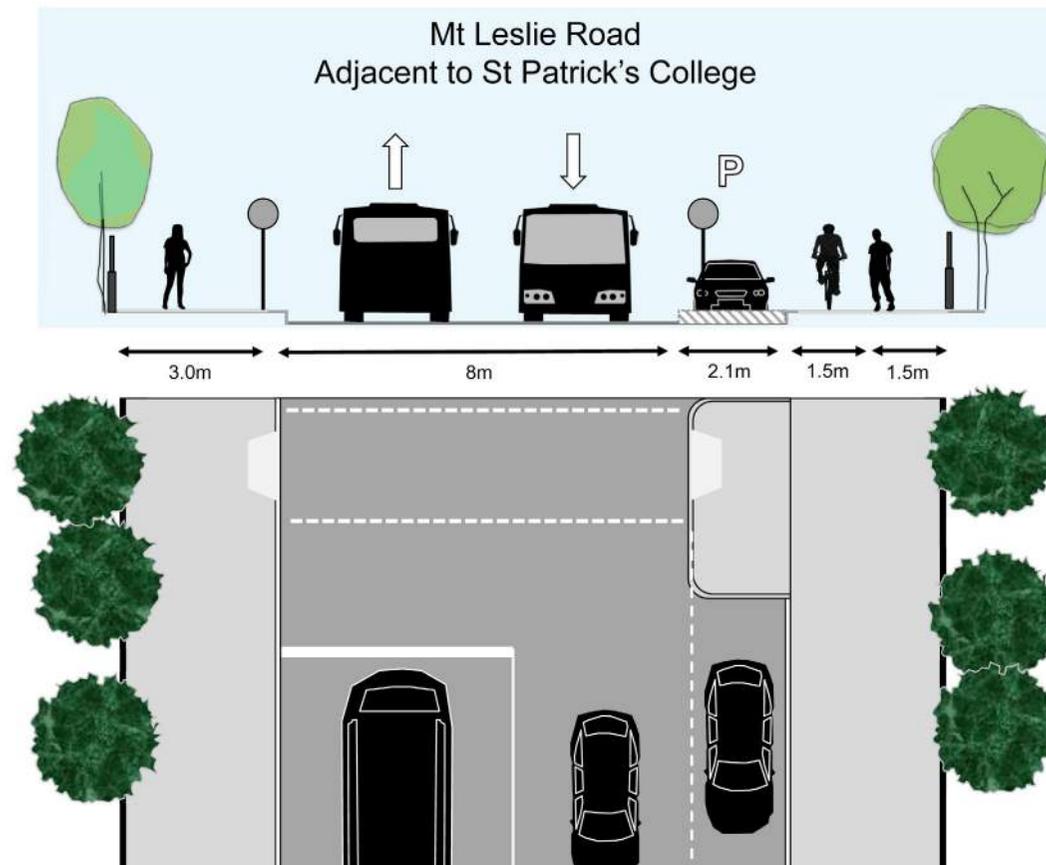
Proposed configuration at Mt Leslie Road / St Patrick's College
